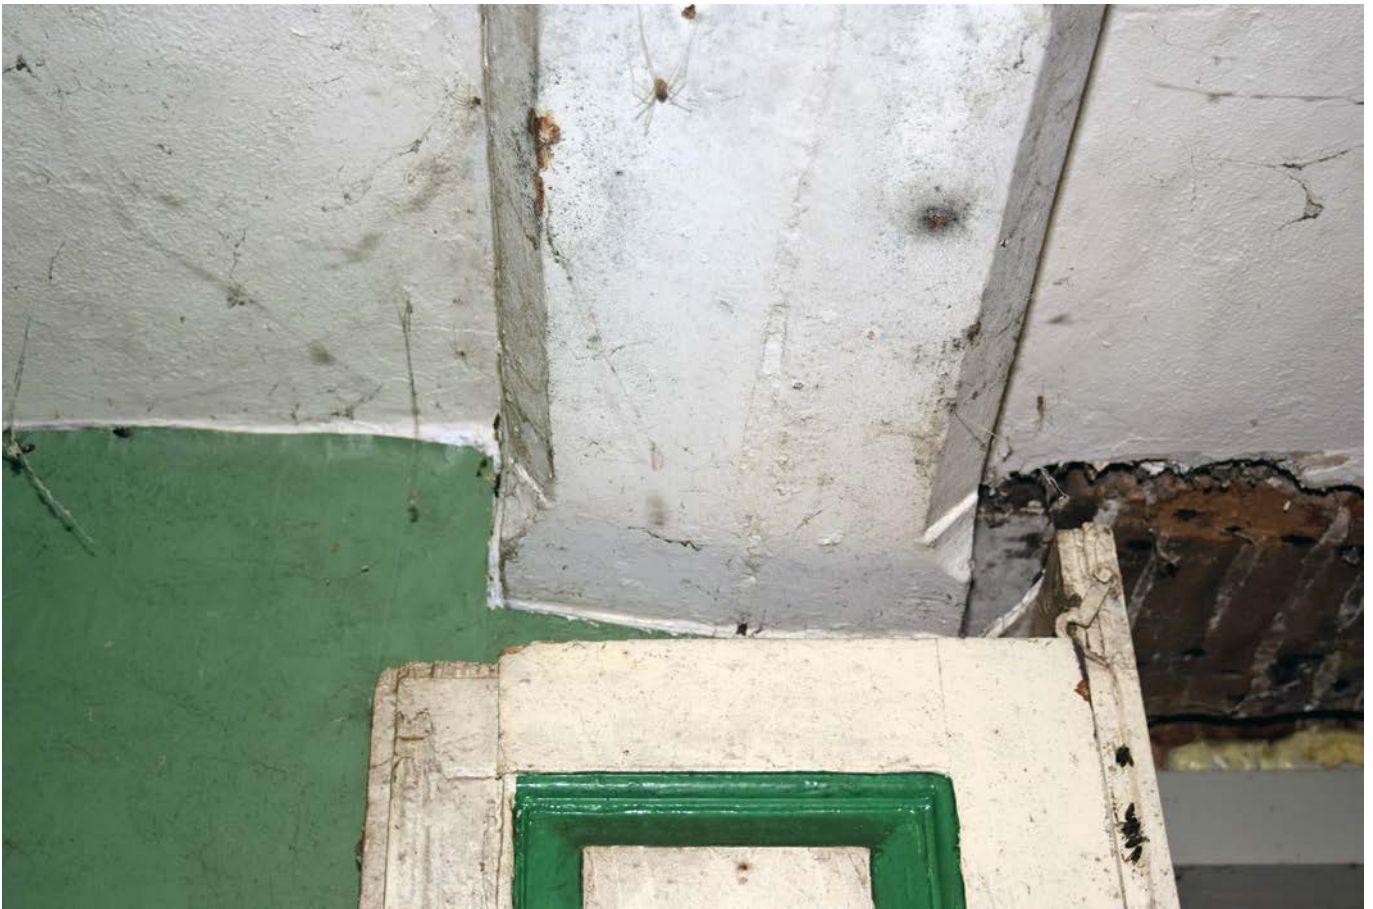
The chamfered beam in the ceiling of the west principal room of Jobsgreen Farmhouse, looking south
